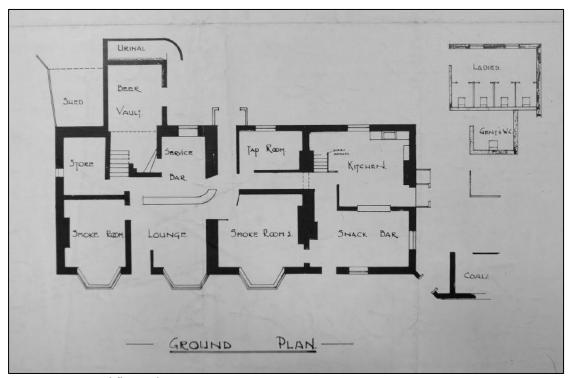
Ground floor plan as existing 1937 (LRO PSBL/20/147)
